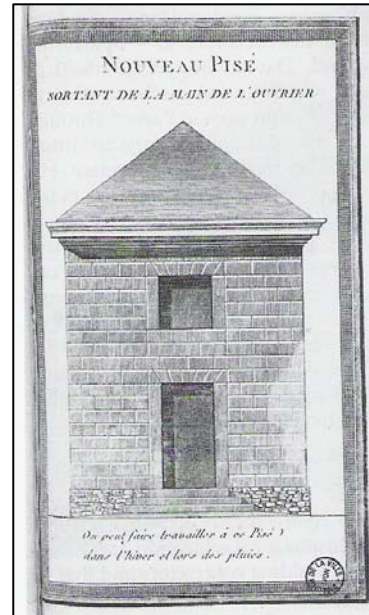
A design for a simple pisé house with a scored stucco exterior. (Image: Louis Cellauro and Gilbert Richaud)
